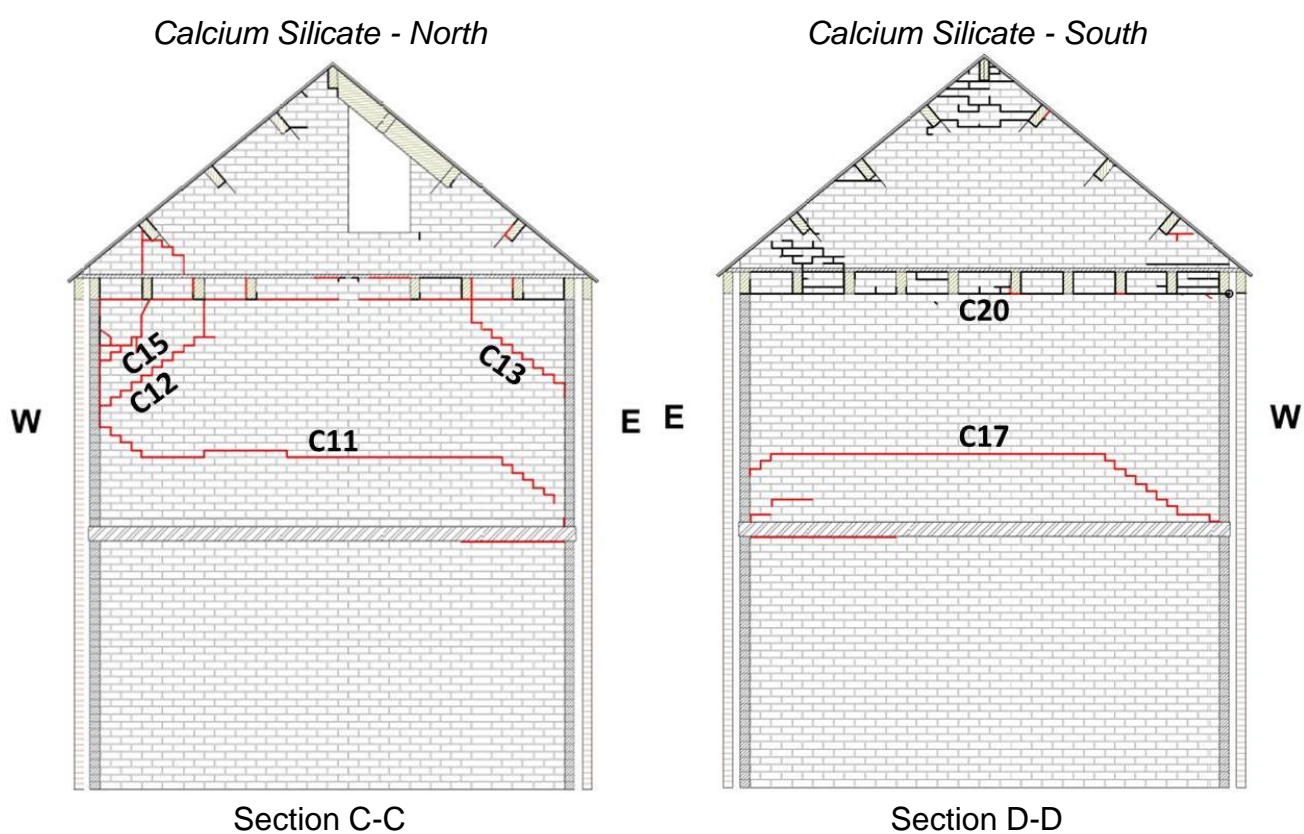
EQ-NPR 85% cracks - Calcium silicate transversal walls.
